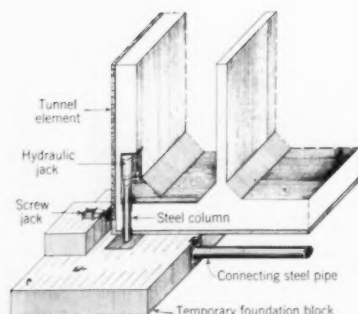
Final accurate positioning of tunnel elements was accomplished by temporary foundation block and jacking equipment shown.
